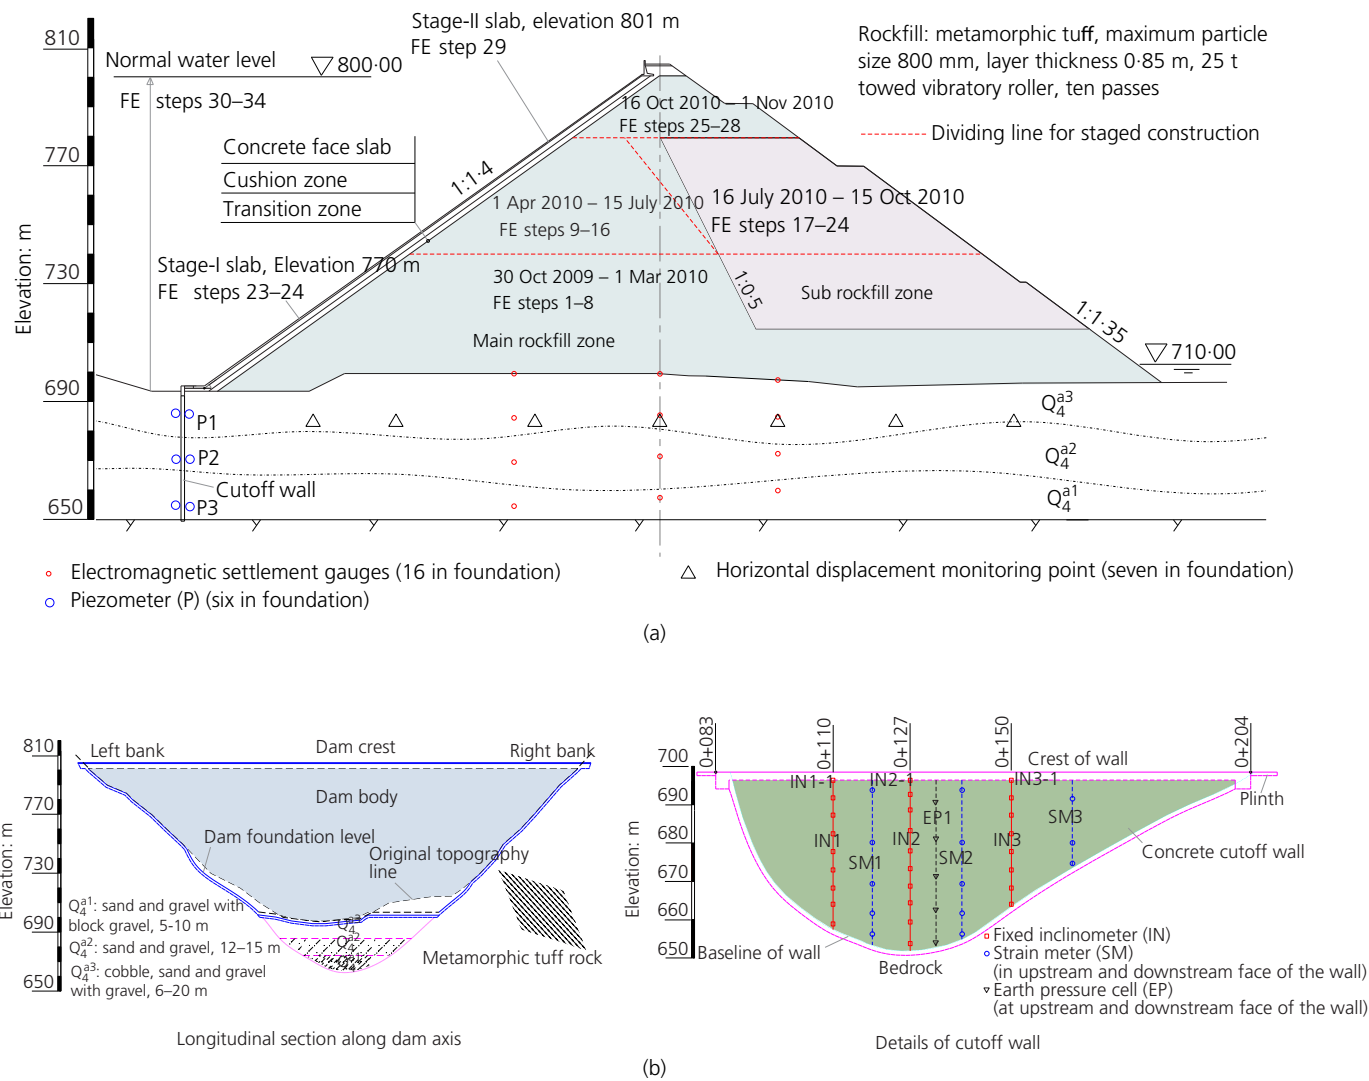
(a) Typical cross-section of Miaojiaba dam. (b) Longitudinal section along the dam axis and details of the cutoff wall
